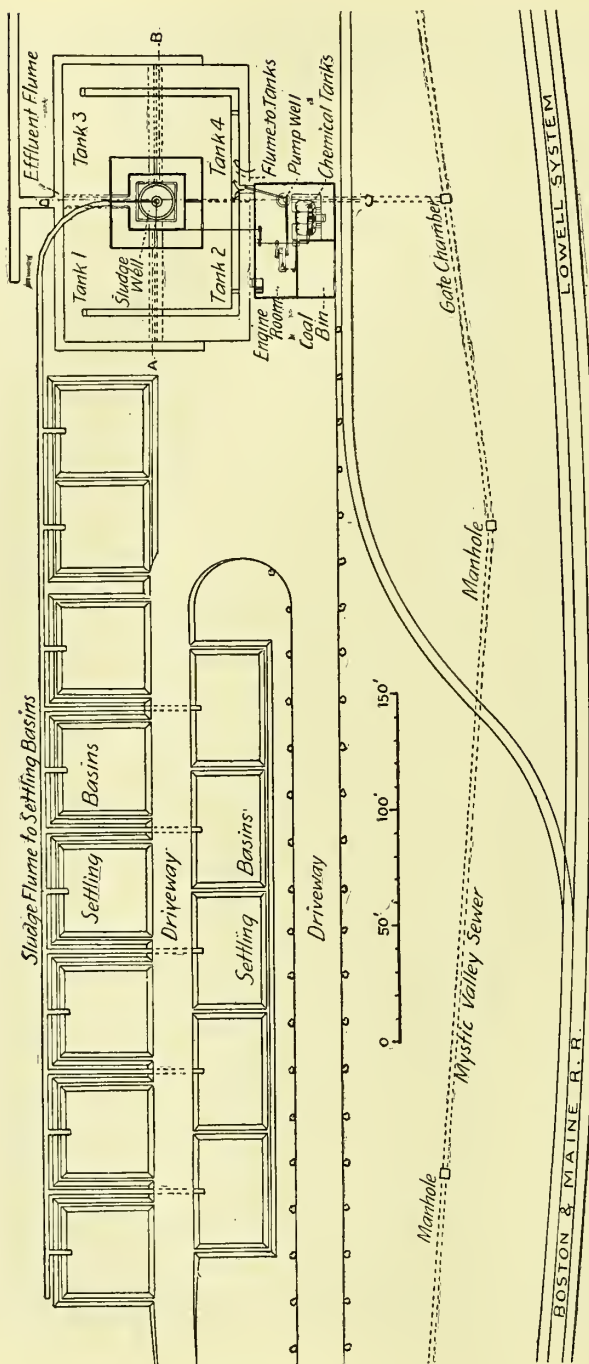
GENERAL PLAN OF MYSTIC VALLEY SEWAGE DISPOSAL WORKS.
